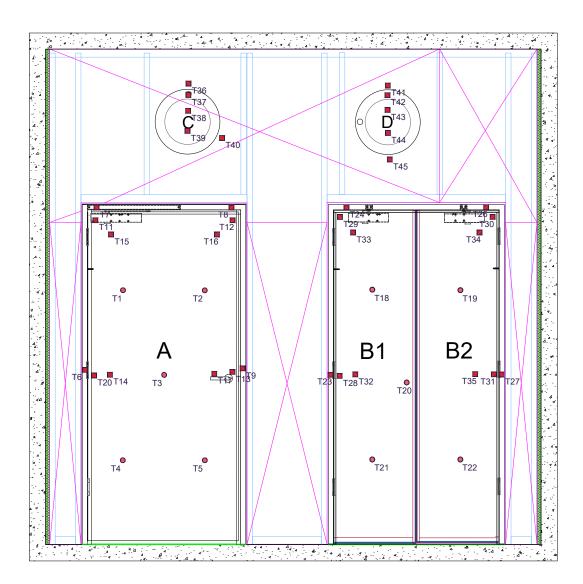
Layout of instrumentation viewed from the unexposed surface of the test construction
